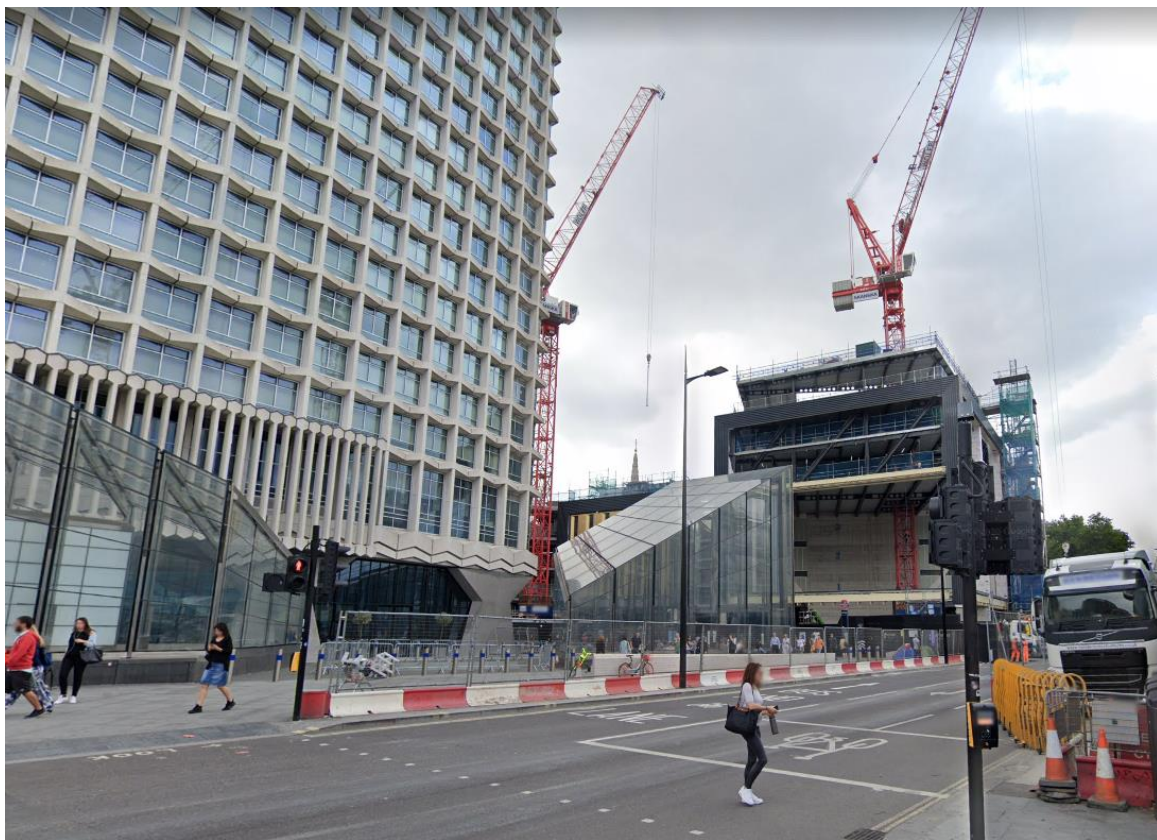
(above): Photo of the application site in August 2019 (taken from Google Streetview)
